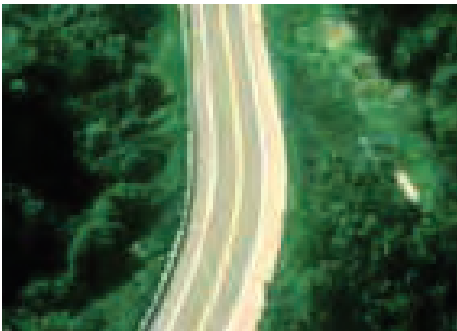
An example of a pullout on a steep slope. Note the planting buffer (static.howstuffworks)
